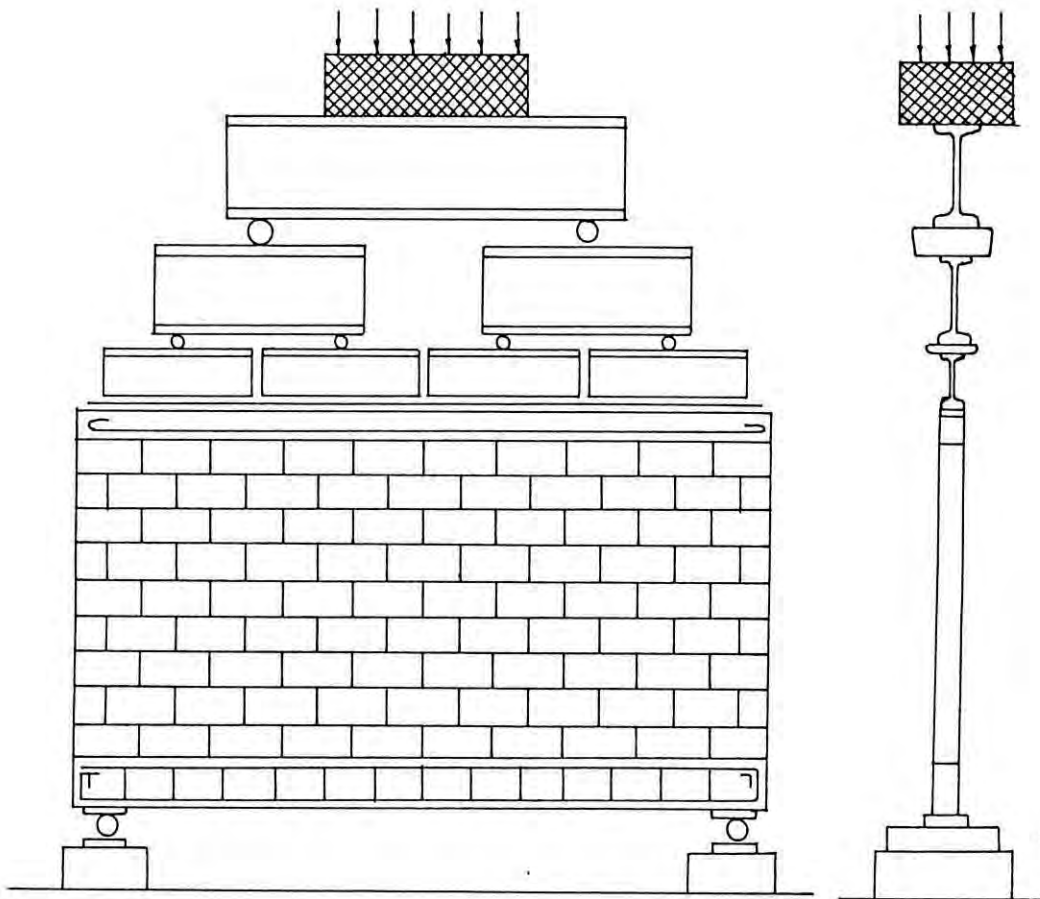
Loading Arrangement (Rosenhaupt)⁽⁹⁾
